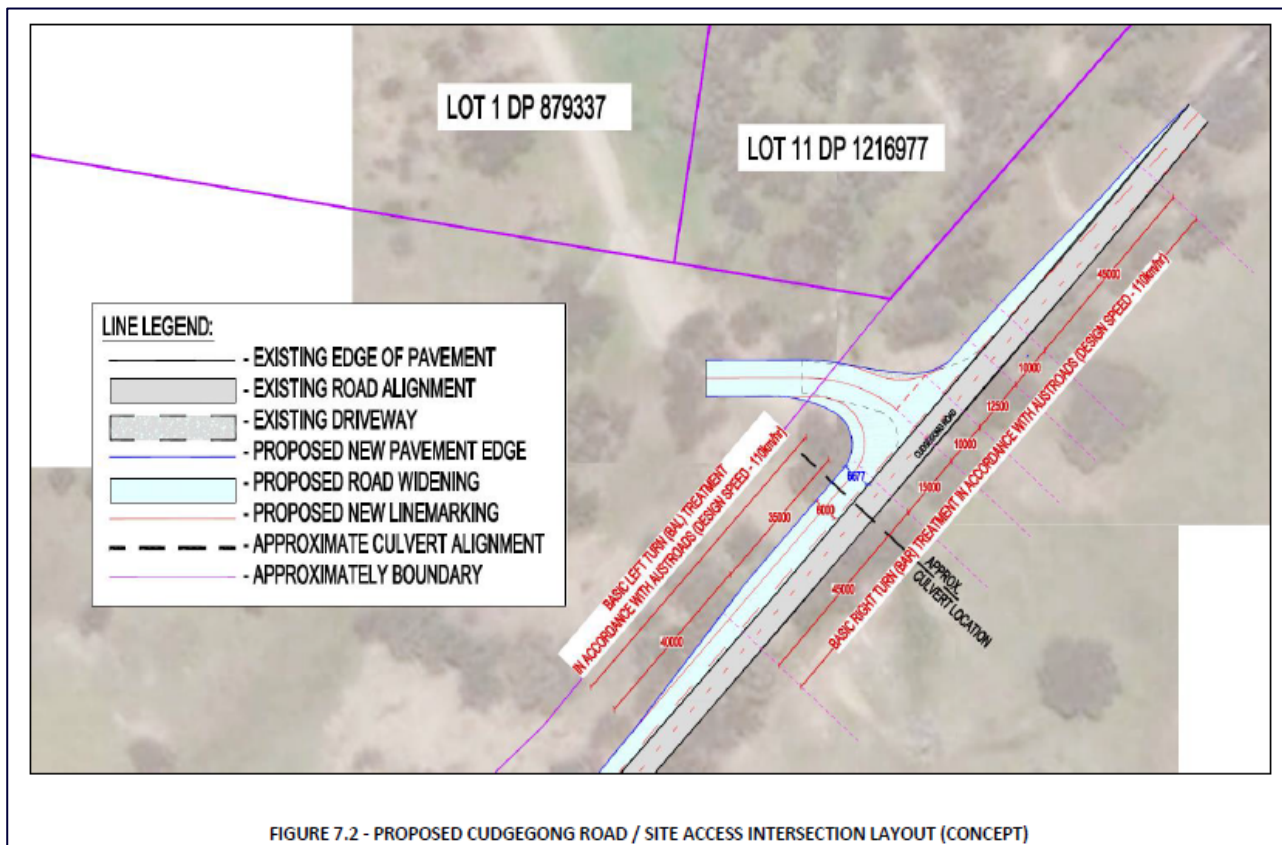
PROPOSED CUDGONG ROAD / SITE ACCESS INTERSECTION LAYOUT (CONCEPT)
